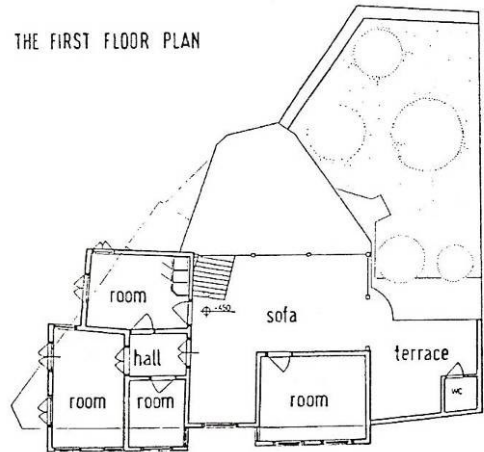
Upper floor plan of the house in Namazgah, İzmir.
